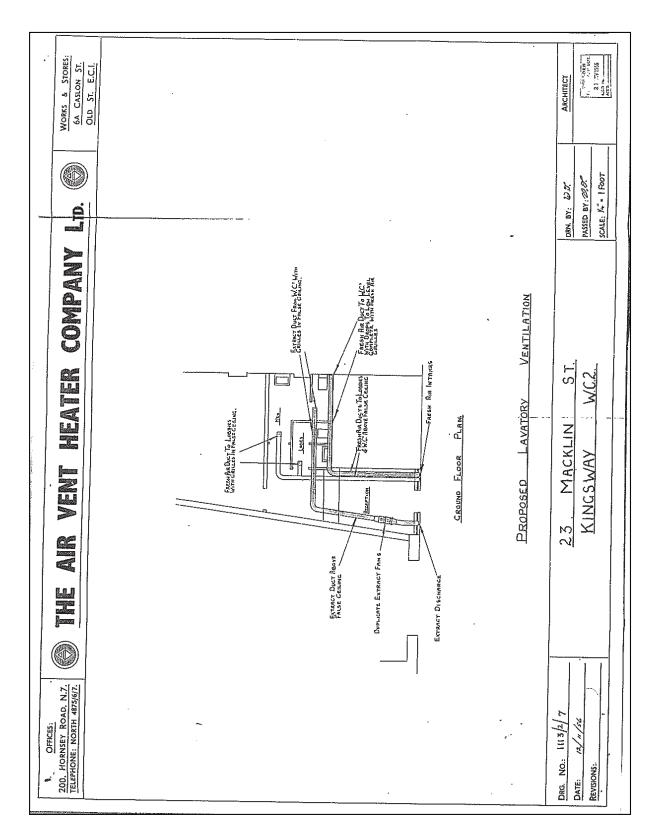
Proposed lavatory ventilation, 1958 (Camden Local Studies Archive)
